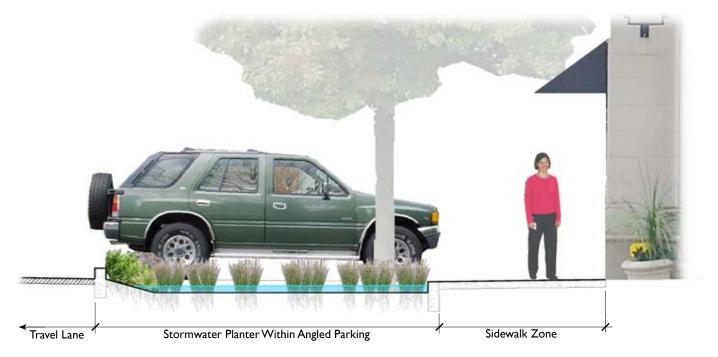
Angled Parking Curb Extensions-Cross Section
